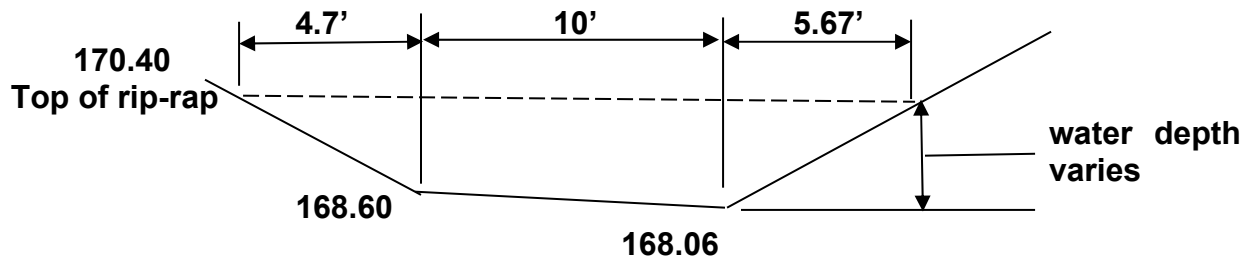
Cross-Section Drainage Channel Section One, 95' south, Looking North
